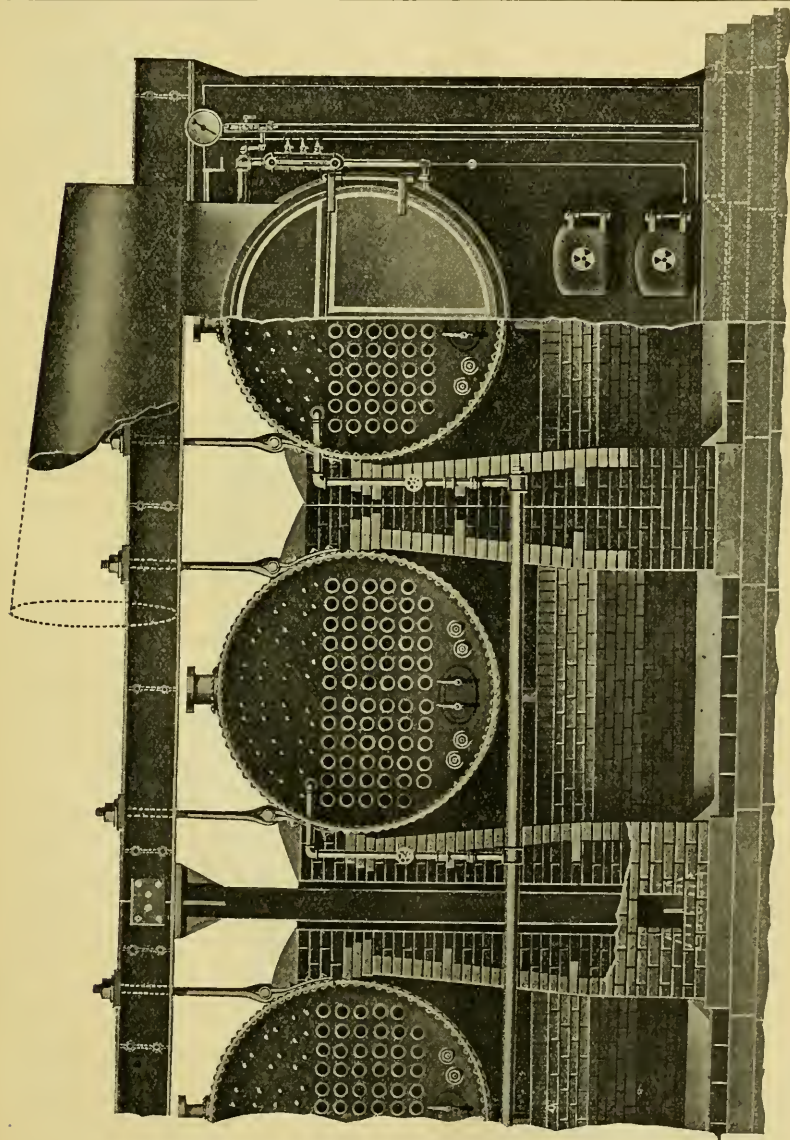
FRONT ELEVATION AND PARTIAL SECTION OF SUSPENDED BOILERS.
